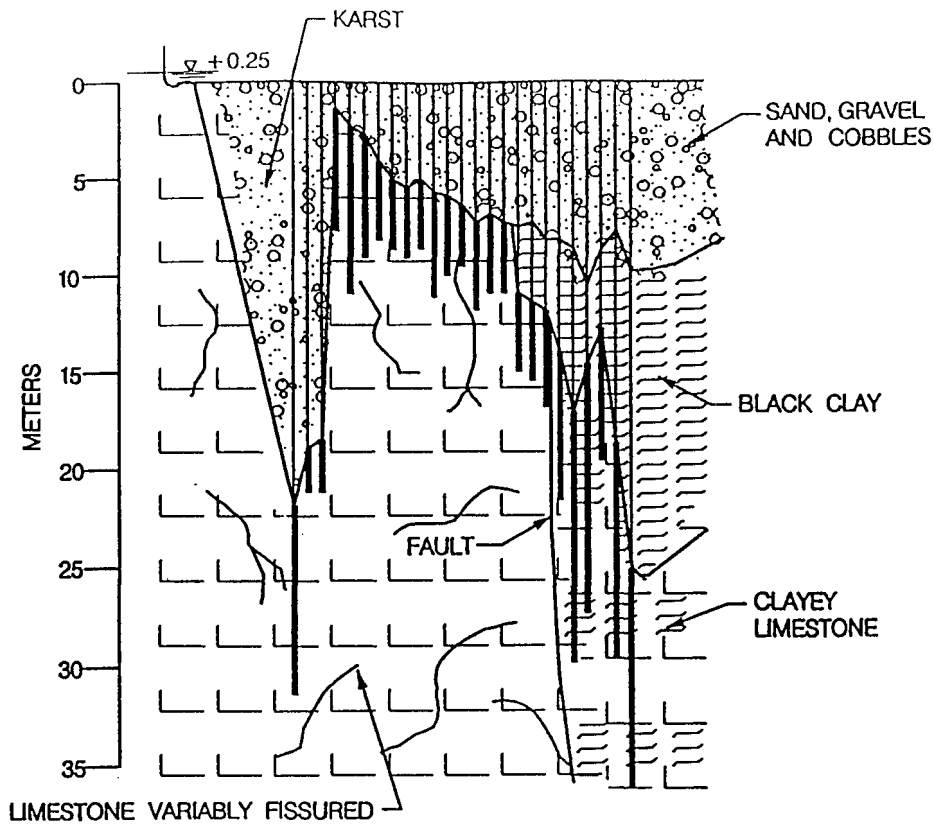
Cross section of a new foundation on "needle piles" adapted to locally variable conditions, "Le Fermentor" Building, Monte Carlo, Monaco (Fenoux, 1976).
